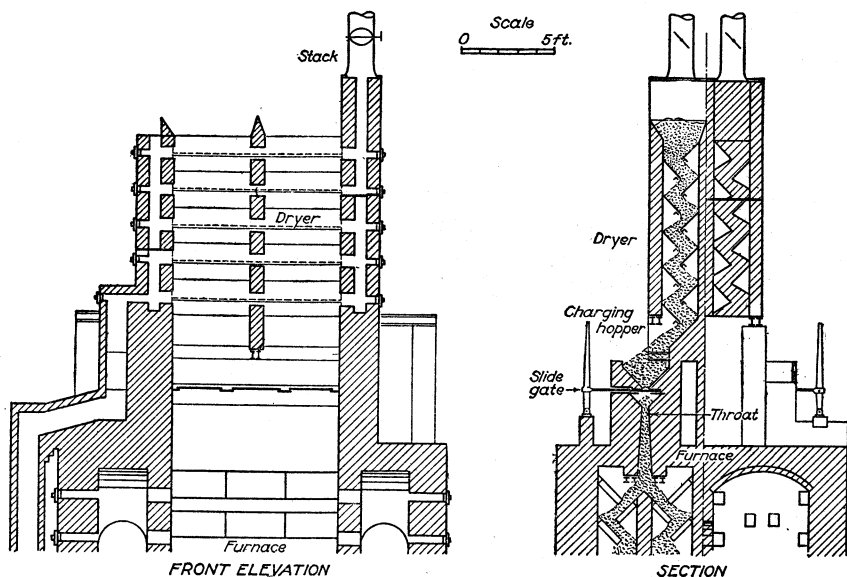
Front elevation and cross section of ore drier on Scott furnace.
